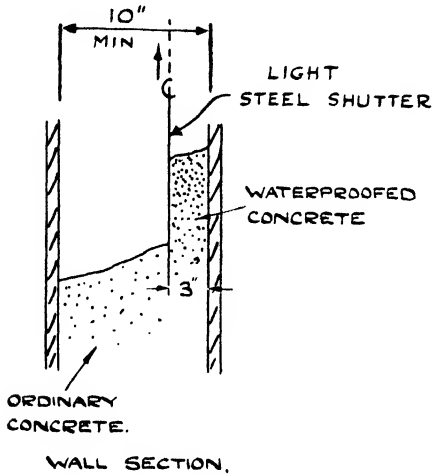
USE OF A MOVABLE SHUTTER TO PROVIDE A WATERPROOF WALL FACE
